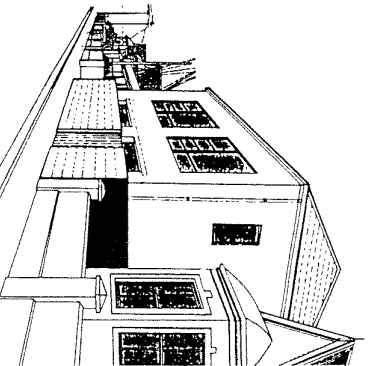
Unsympathetic relationship of new building to the street and to adjacent buildings . Inappropriate fenestration and boundary wall
